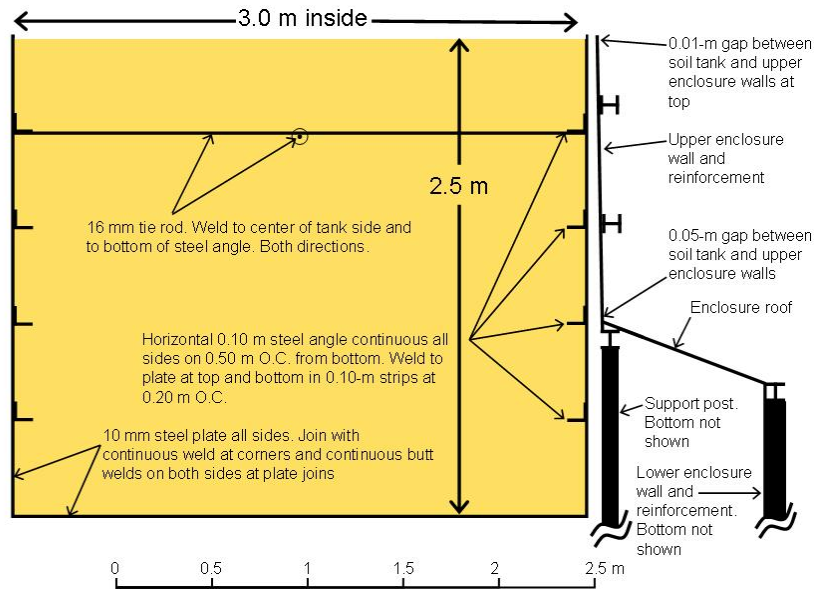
Soil tank construction showing internal reinforcement with steel angle and tie rods. Also shown is one side of outer enclosure upper and lower walls, roof, and reinforcement.
